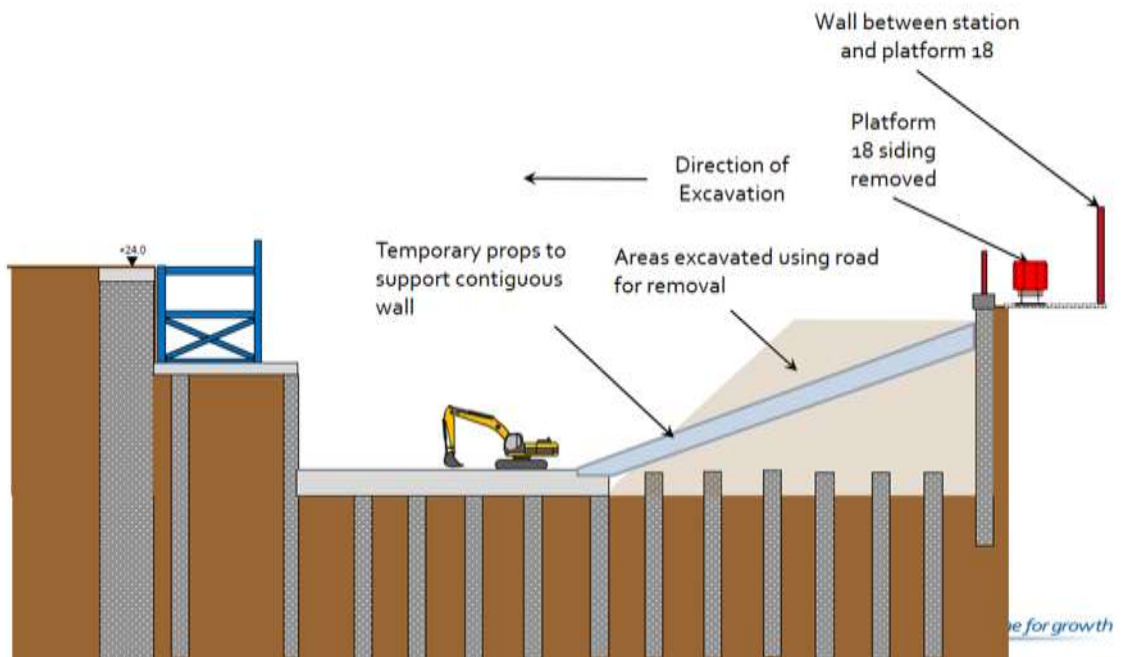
Platform 18 cross section basement excavation with props Piling arisings
